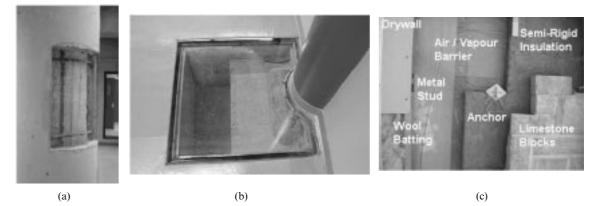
Exposed structural features in the ILC: (a) reinforcing bars in concrete column; (b) typical column footing; (c) details of wall insulation.
